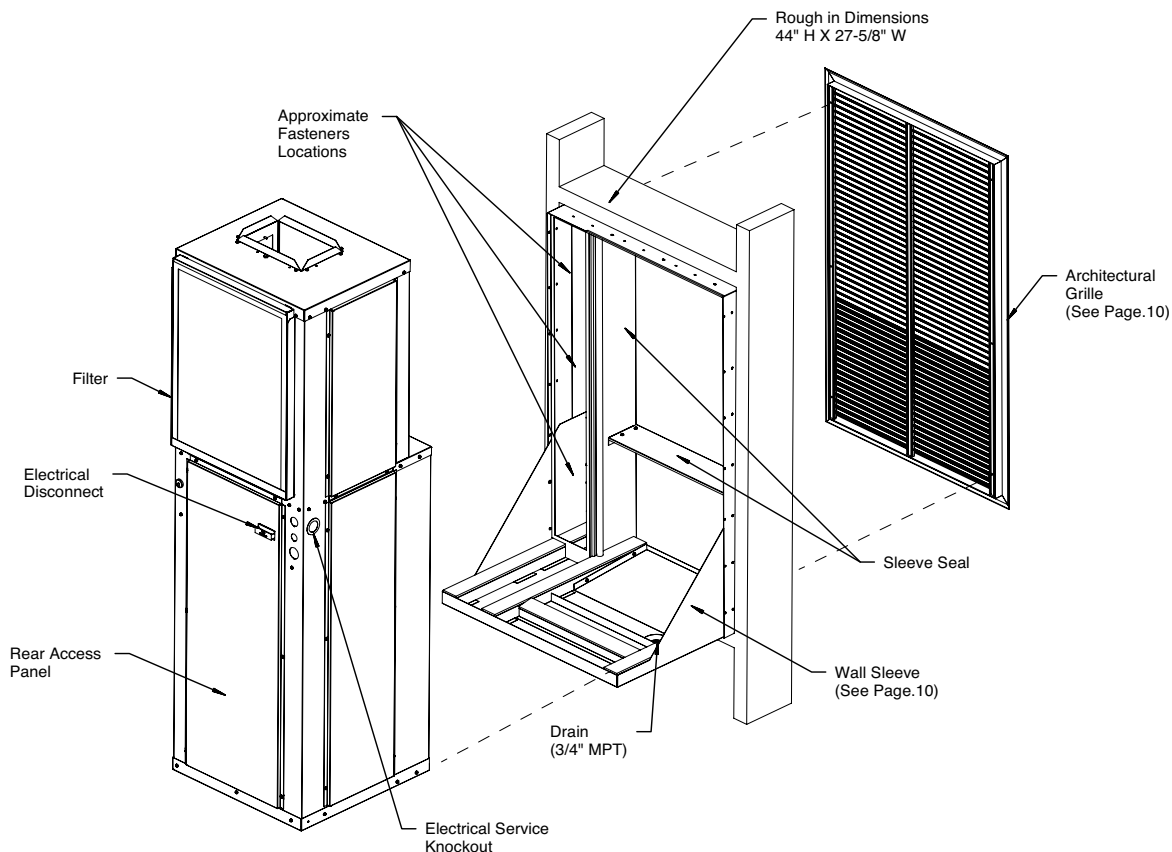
B - General Assembly for Large sleeve and Grill for 09-18 sizes with block off
